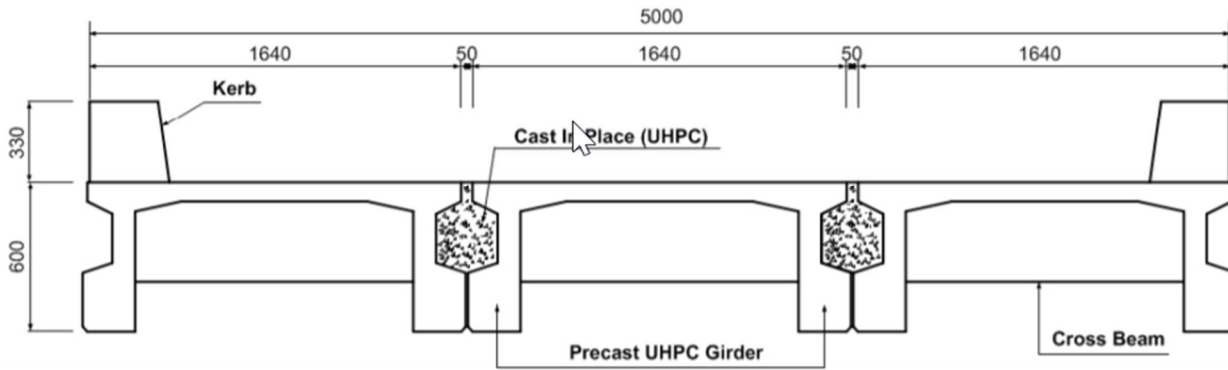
Cross Section of the UHPC trial Bridge in Korea (Park et al., 2013)
